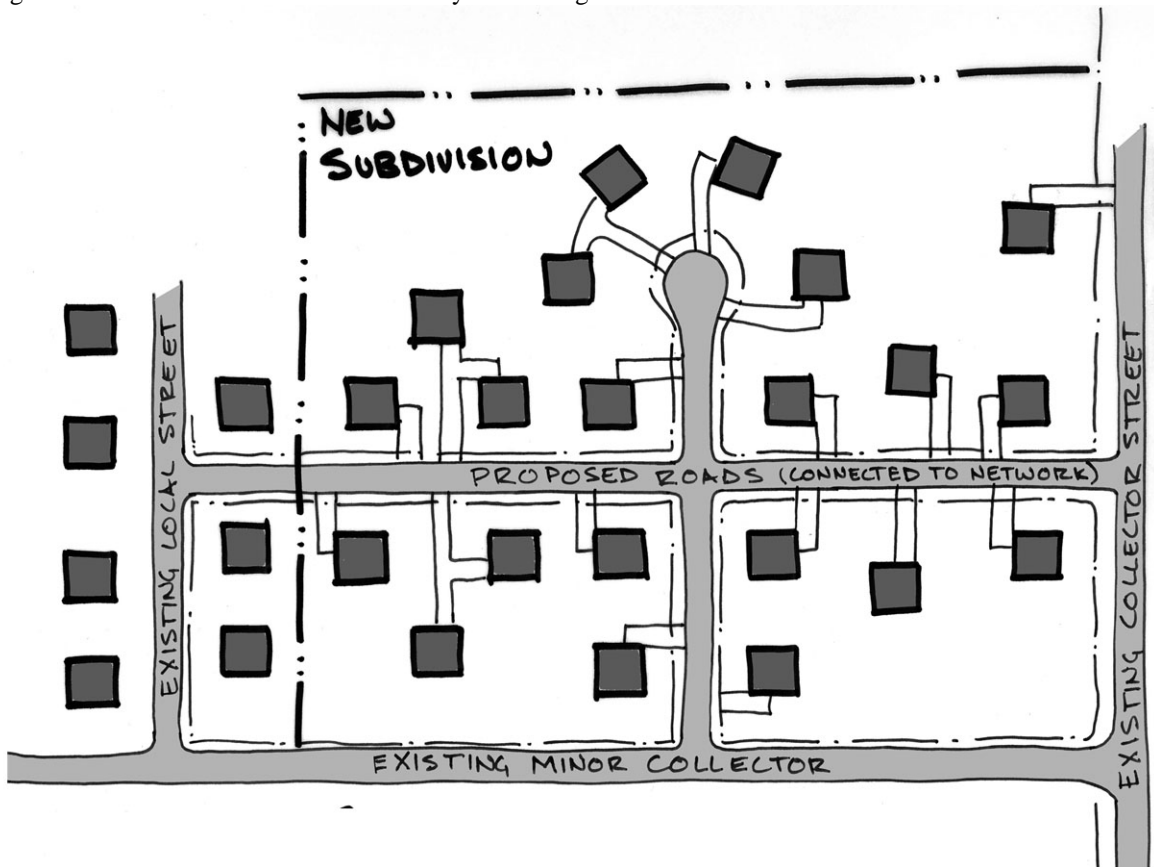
Subdivision with Connectivity to Existing Road Network
